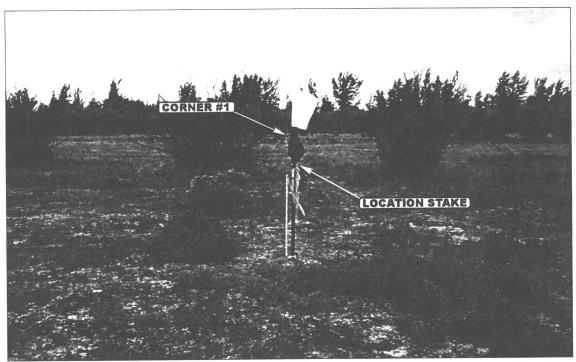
PHOTO: VIEW FROM LOCATION STAKE TO CORNER #1
